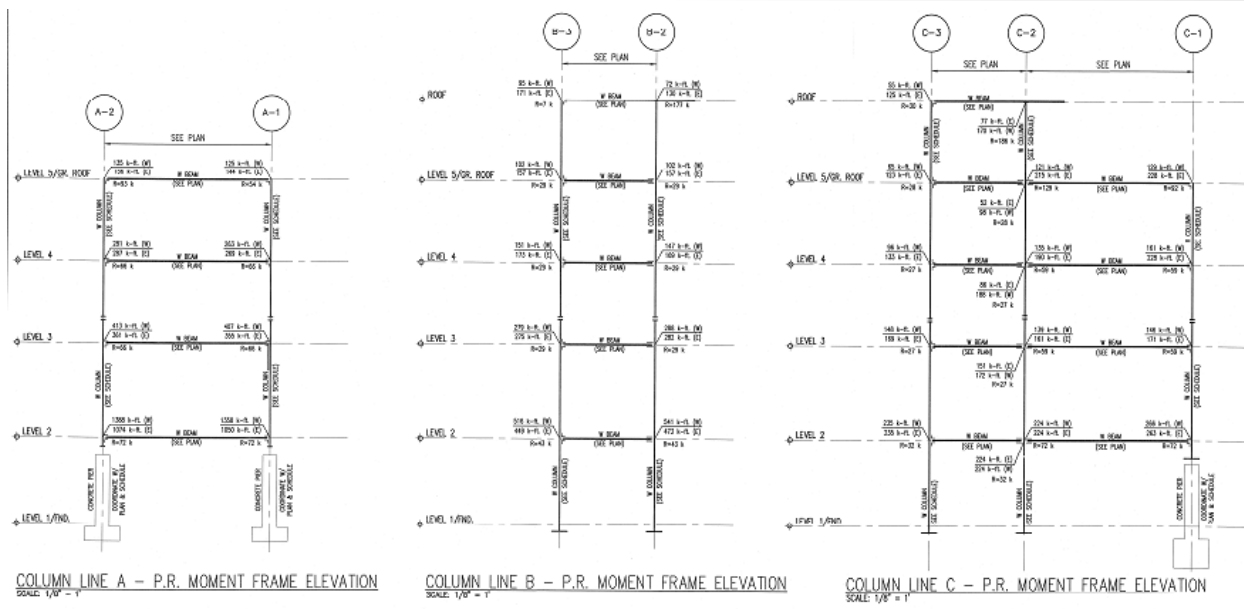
P.R. Moment Frame Elevations (A, B, and C)
